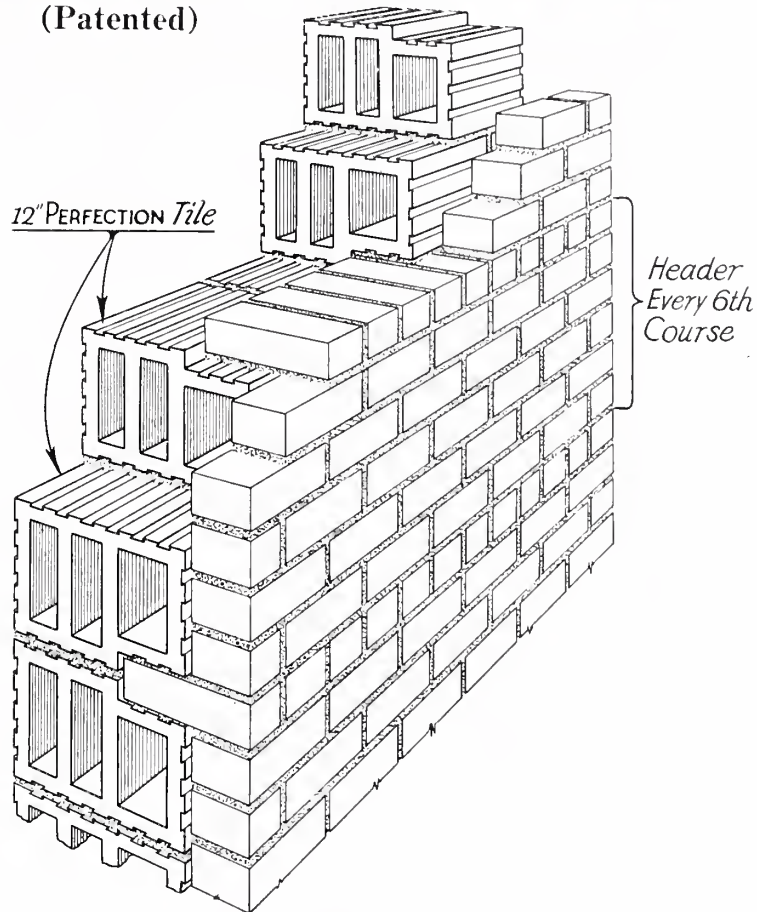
Section of sixteen-inch load bearing wall with brick veneer backed with twelve-inch PERFECTION BLOCK.
